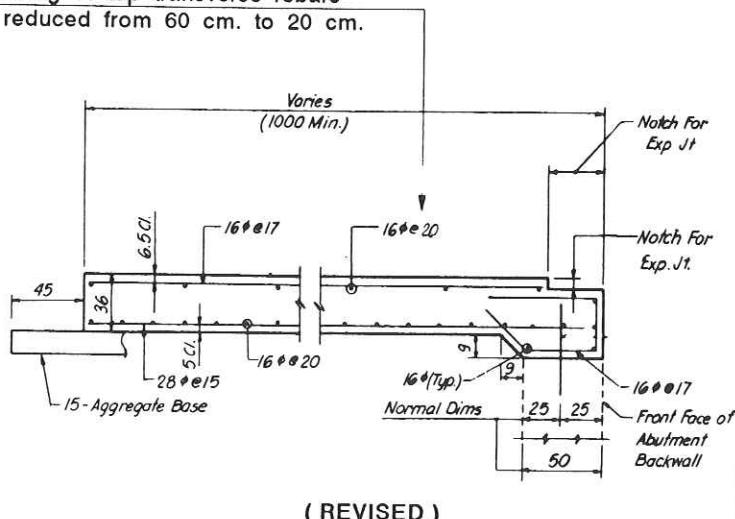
APPROACH SLAB - REINFORCEMENT DETAILS
